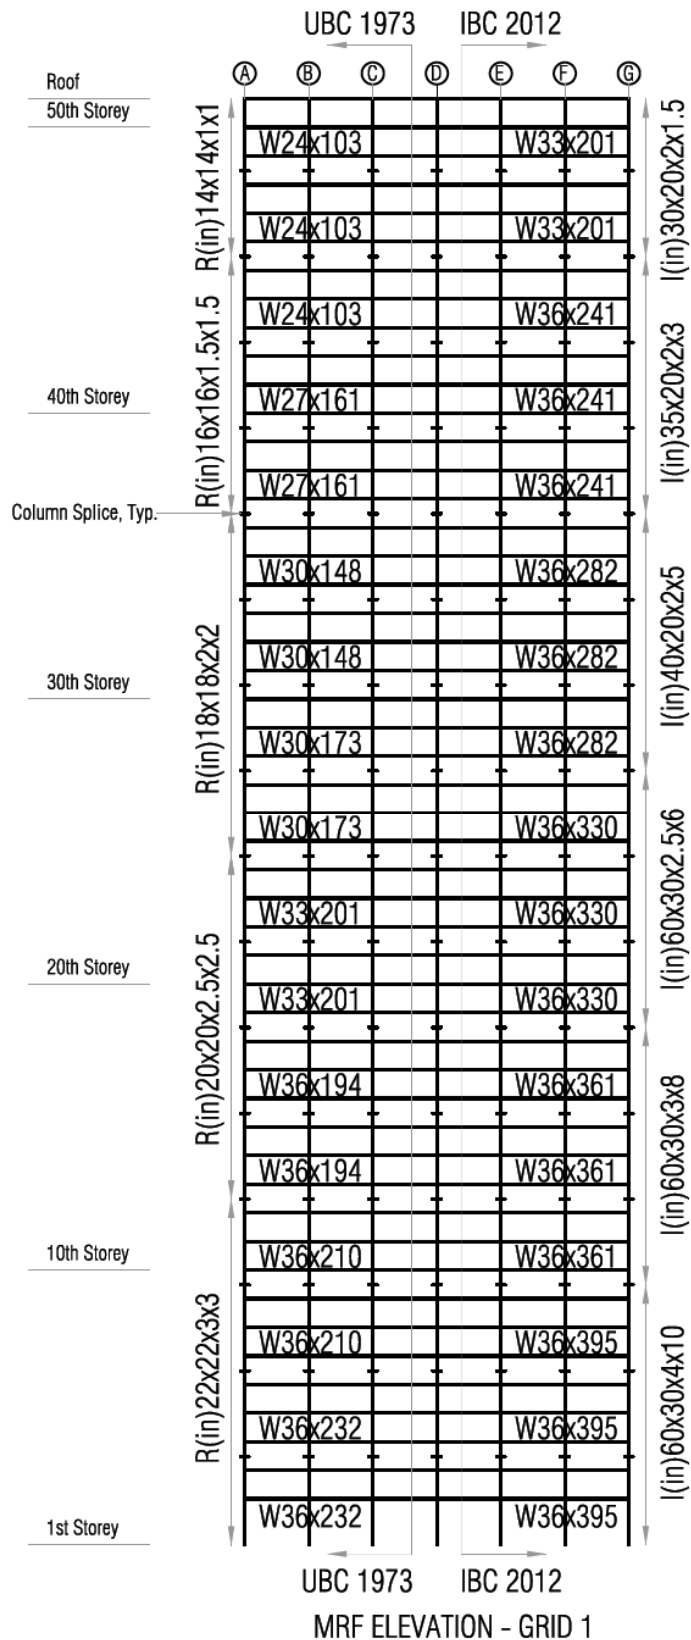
1973 and 2012 archetype building elevation drawings of lateral resisting system illustrating typical section sizes in beams and columns.
